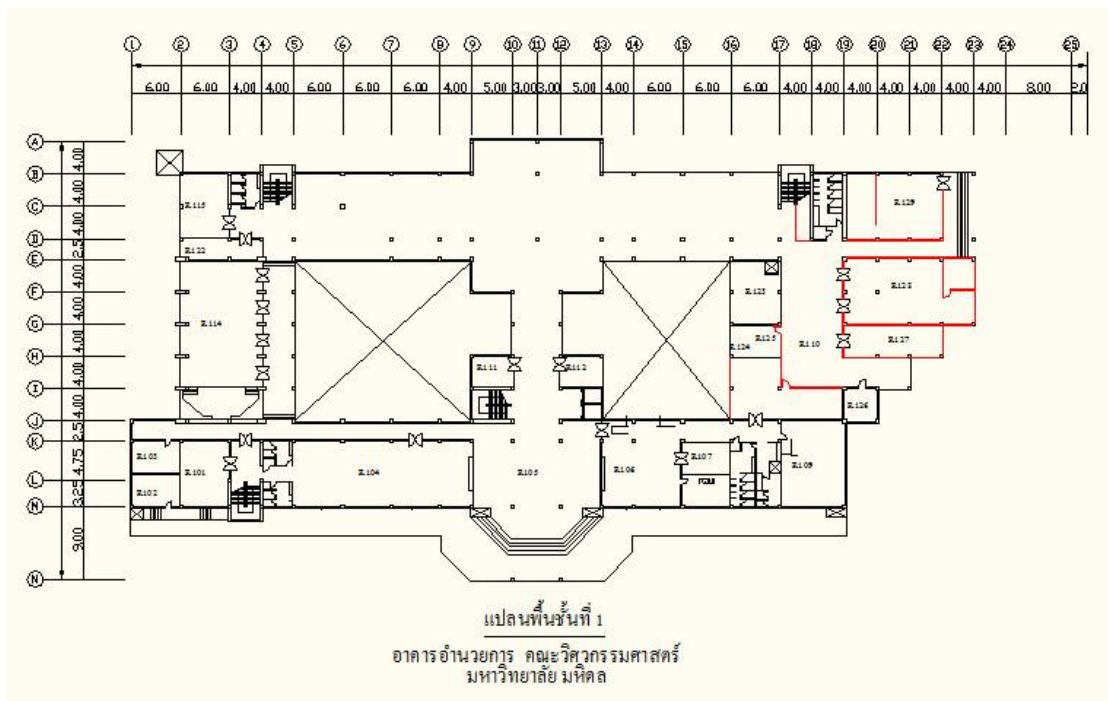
Plan of the faculty of Engineering building1, 1st floor, Mahidol University
